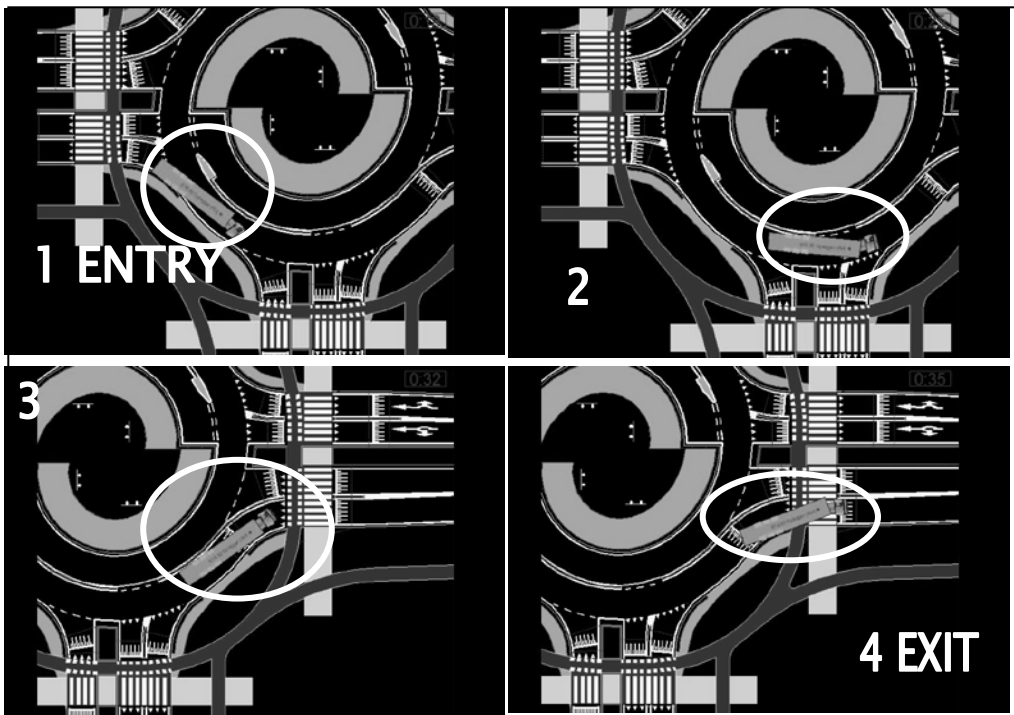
Swept path of the design 17m semi-trailer used in New Zealand when negotiating a turbo-roundabout built to Dutch dimensions (left-hand drive layout): left turn
